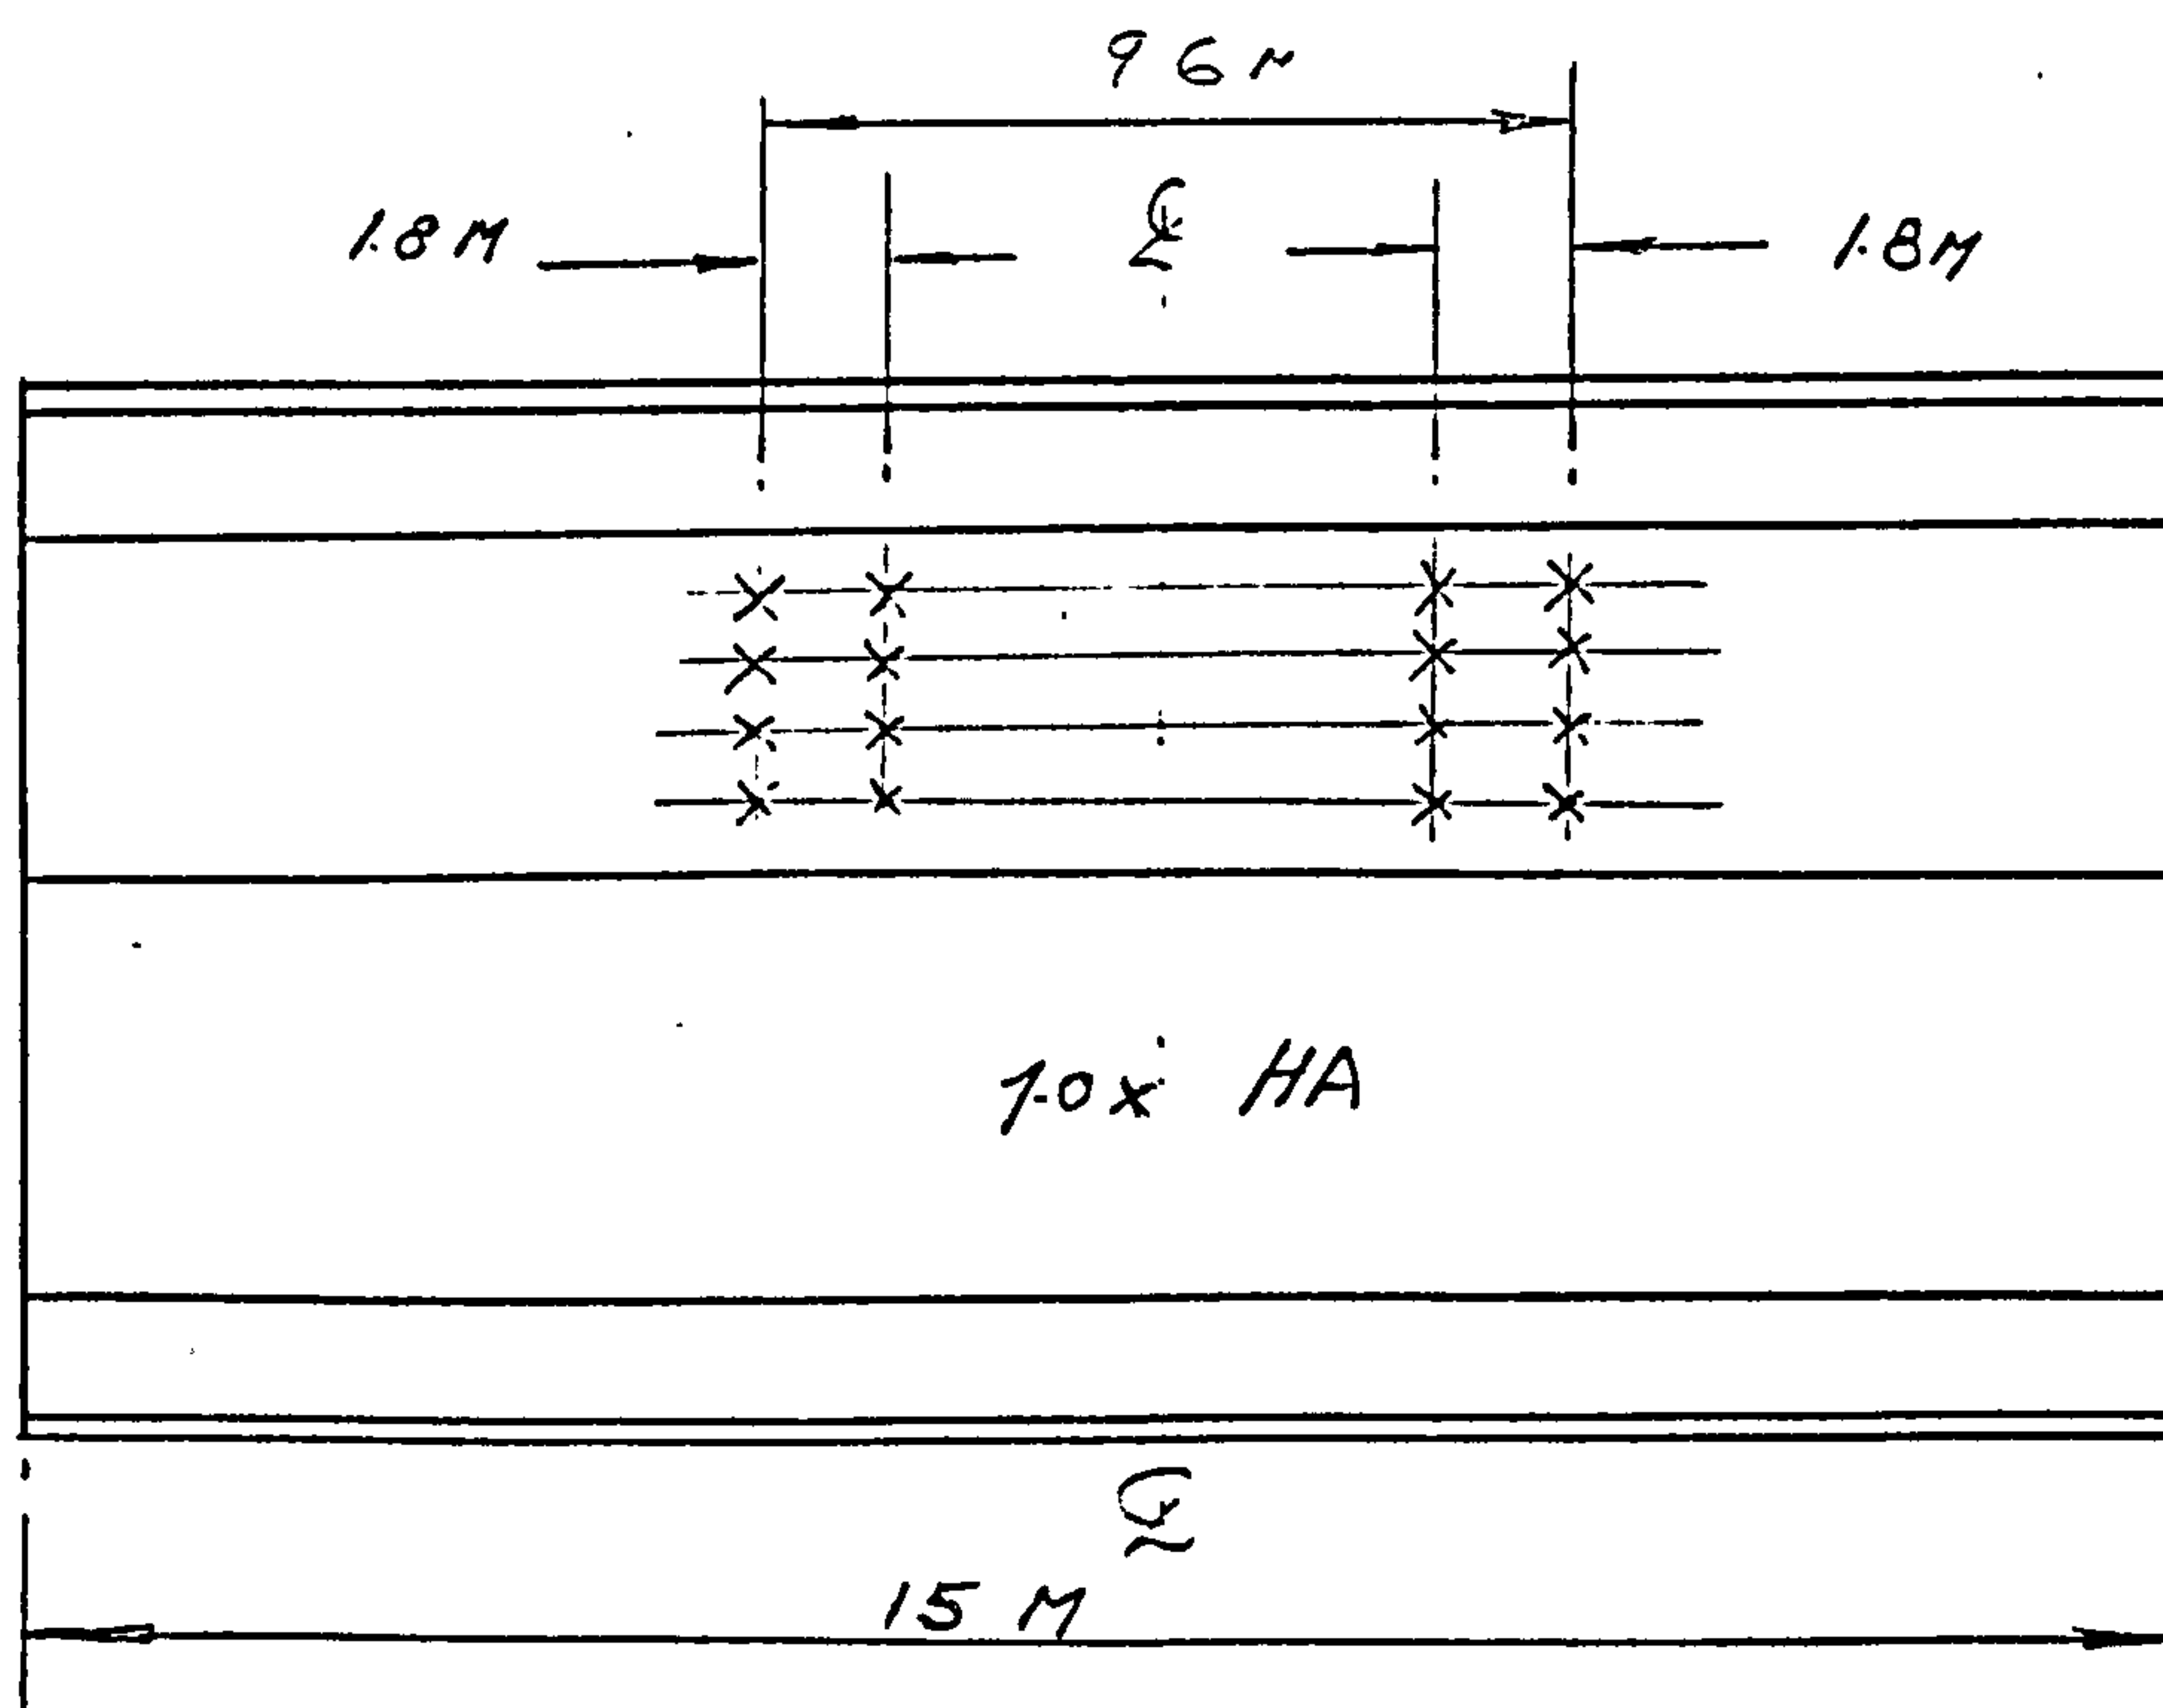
Bridge loading for the 15 m two lane single carriageway slab bridge.
